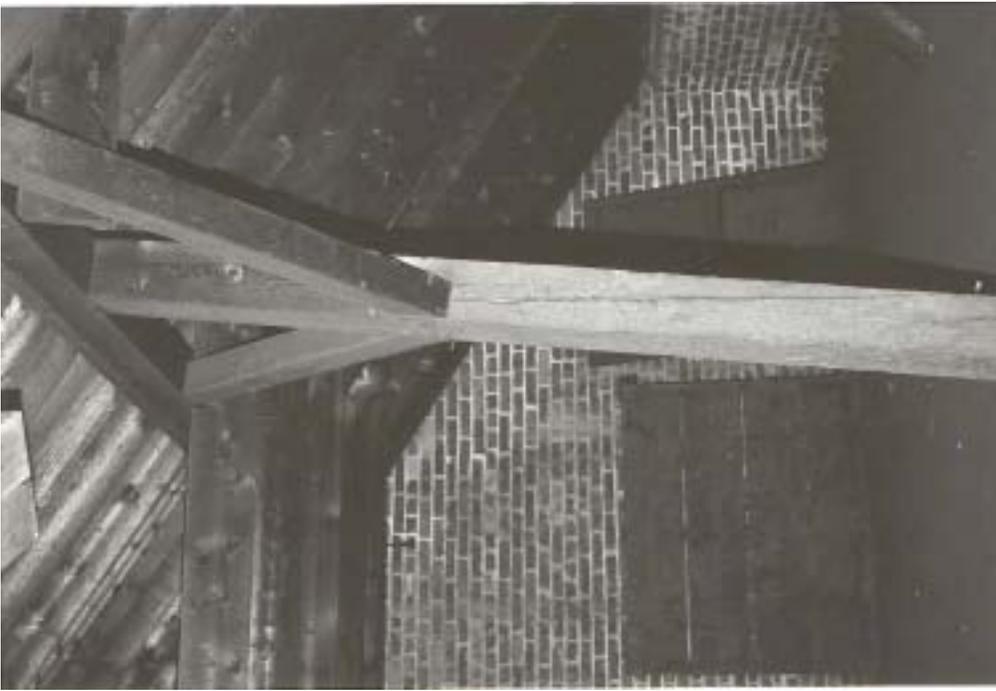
Room 301 (north part of attic), southwest corner: roof framing (angled post and braces) [1993].
